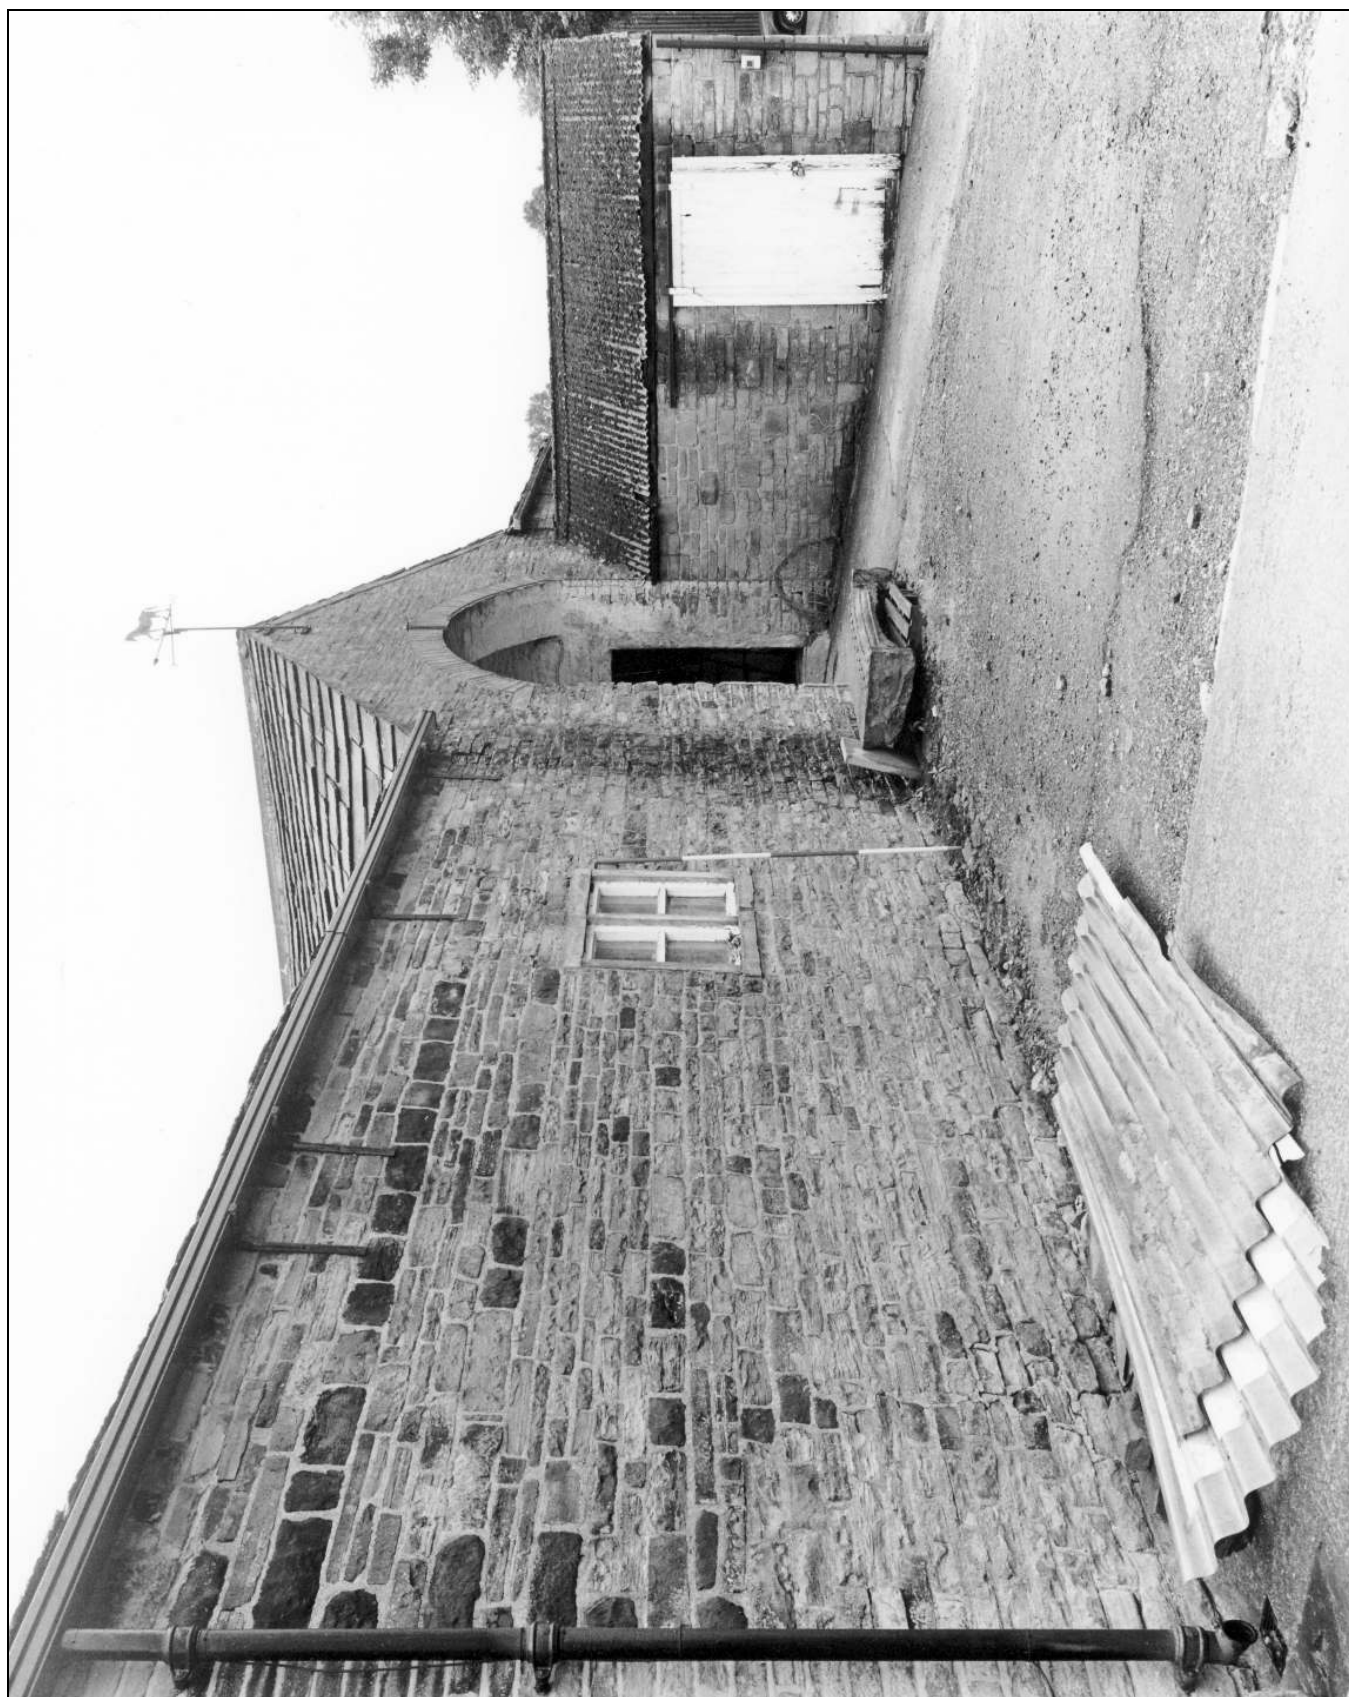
The west side of the barn with gabled entry, from the north (film 1, frame 6)
